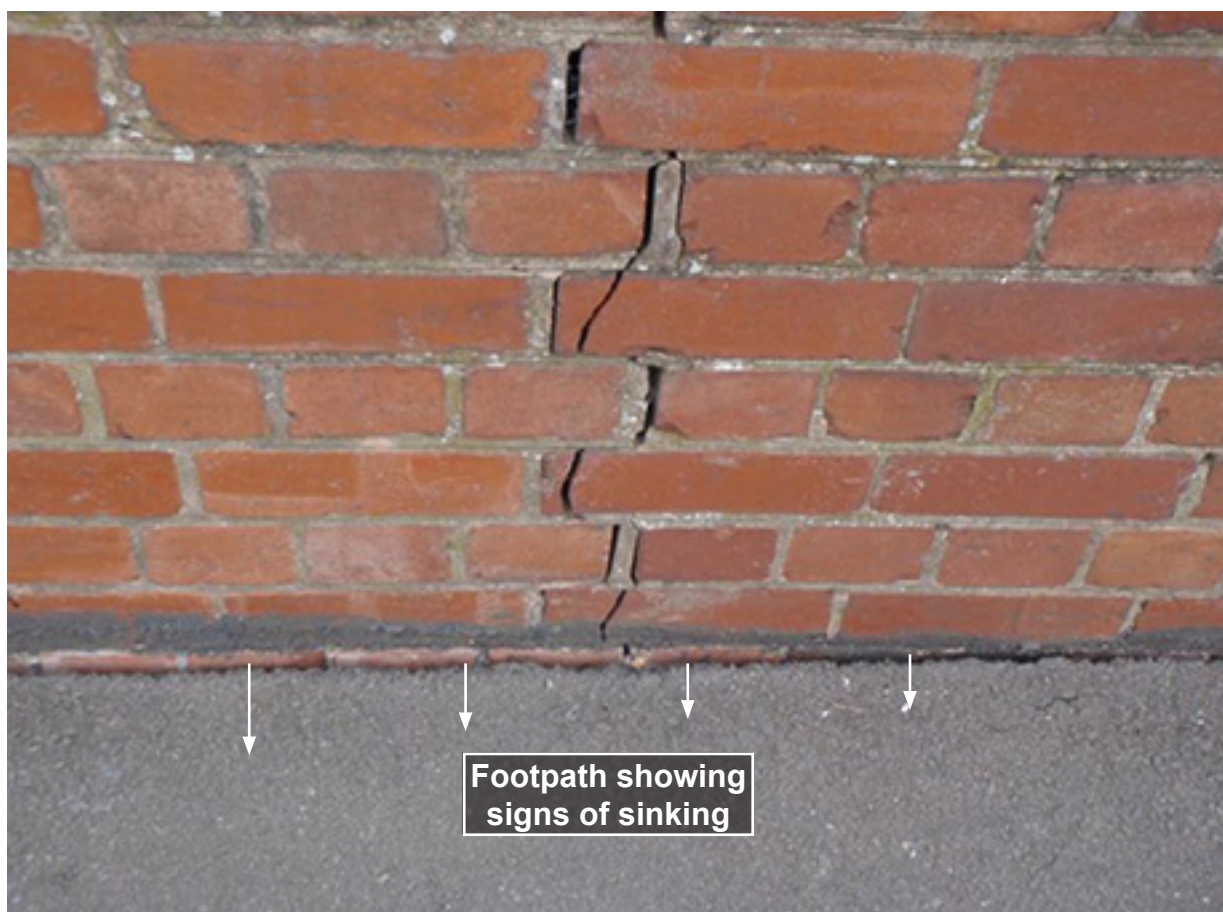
September 2009 - first report of footpath sinking adjacent to the vertical crack (image courtesy of Network Rail)
